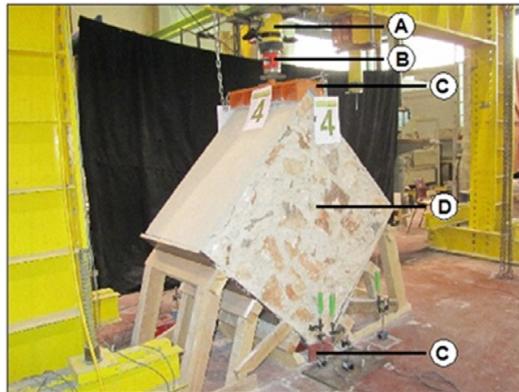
Diagonal Compression test setup, A: Hydraulic jack, B: Load cell, C: Loading shoes, D: Masonry panel (Milosevic et al., 2013).
